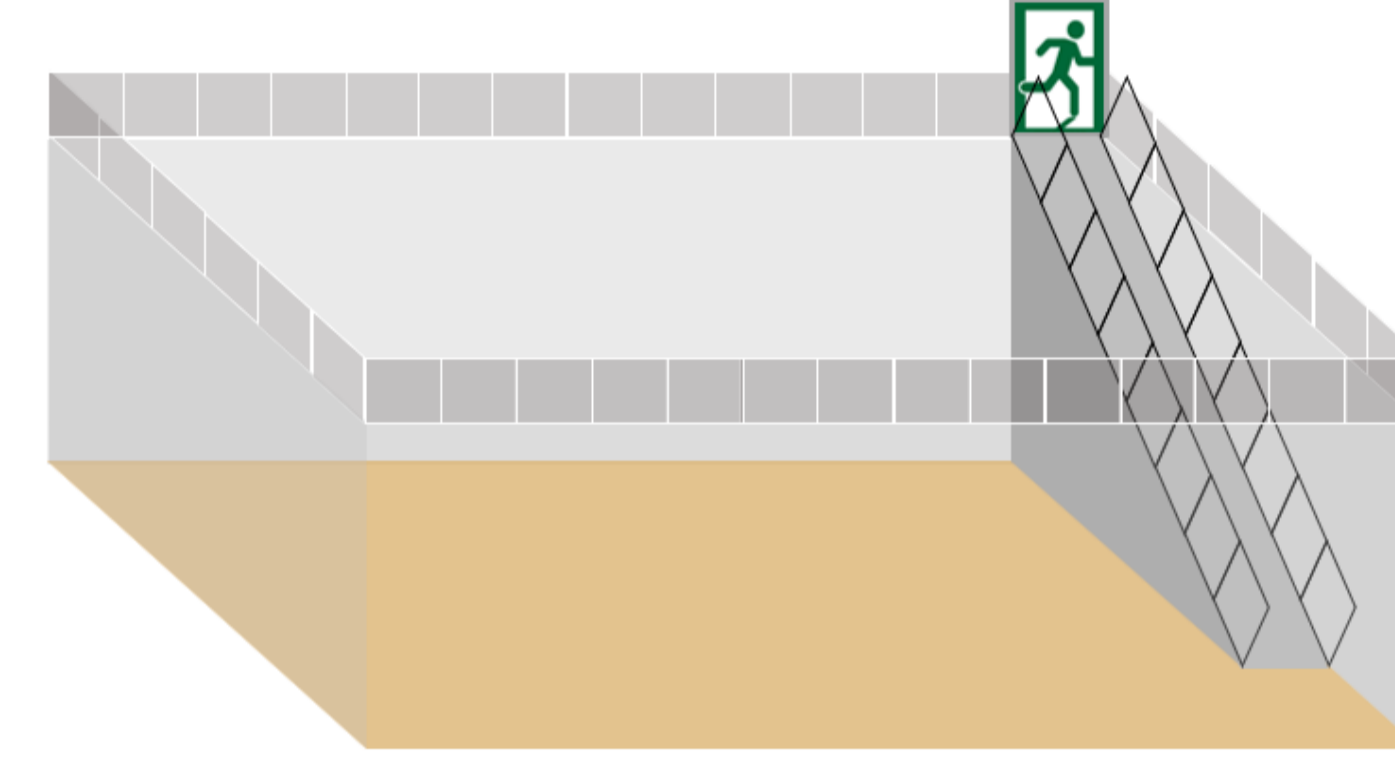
Schematic Diagram of a Hypothetical Excavation Site
